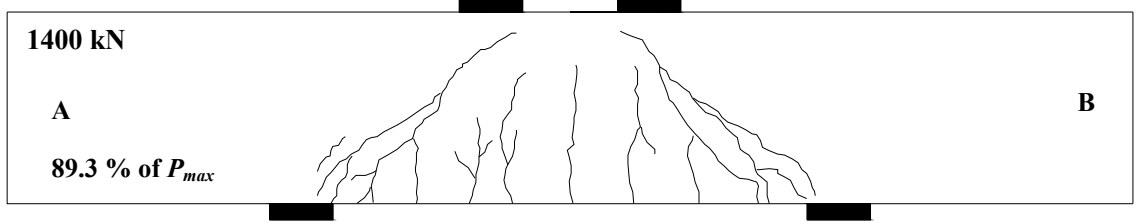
Crack development and crack width of MW1-2 at 1400 kN
